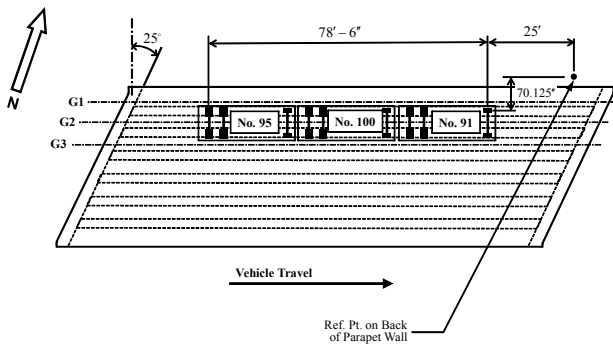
Loading protocol used to examine lane load distribution among the girders in Bridge B-20-148 (1 ft = 0.305 m and 1 in. = 25.4 mm)
